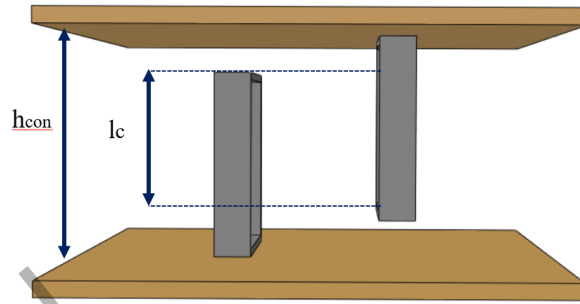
Sandwich system dimensions with One-end Welded Box-profile Shear Connectors
